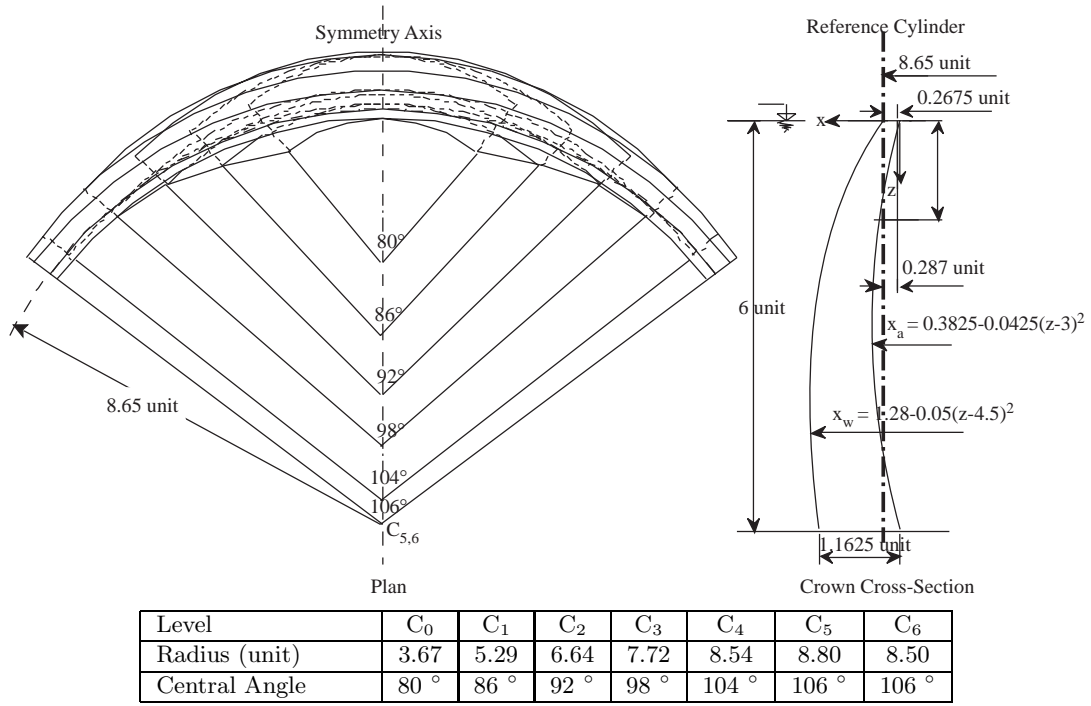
The view in plan and the vertical crown cross section of Type-5 arch dam (ICE, 1968).
